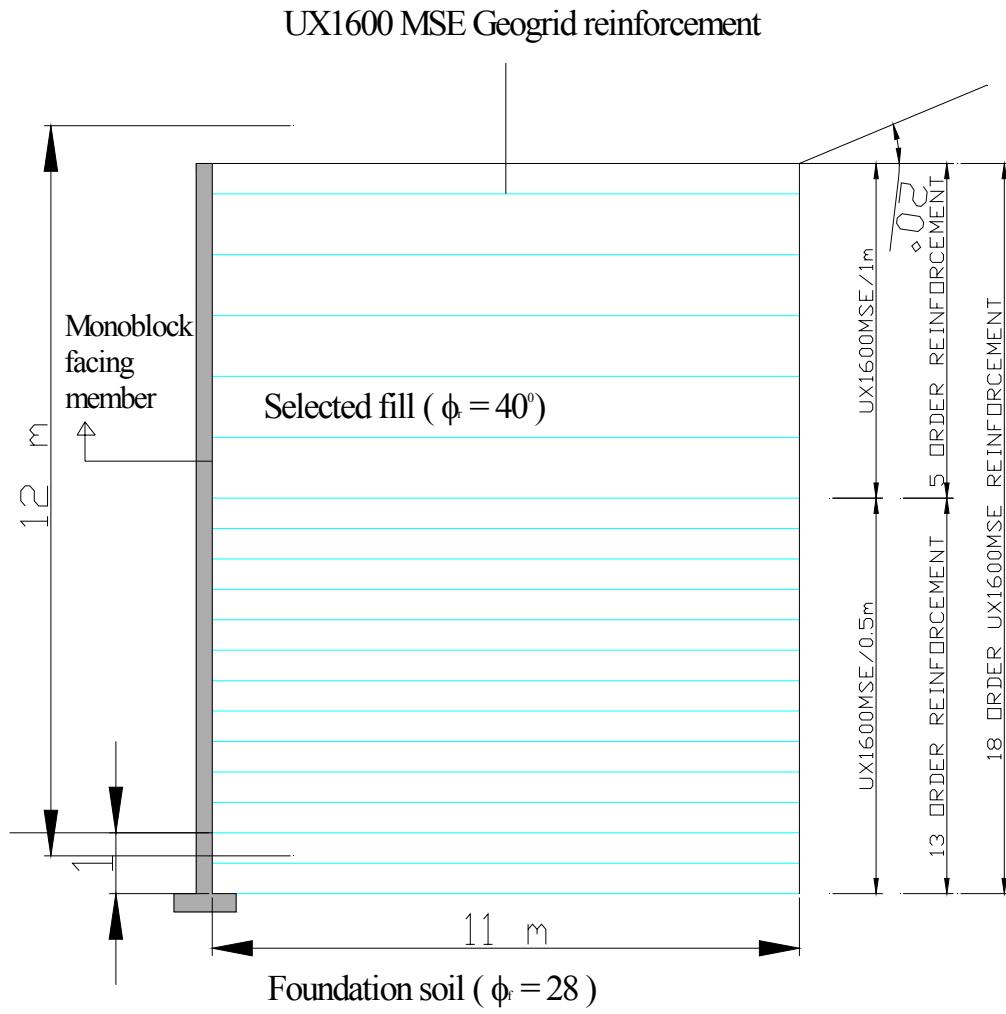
Final geometry of proposed reinforced earth retaining wall
